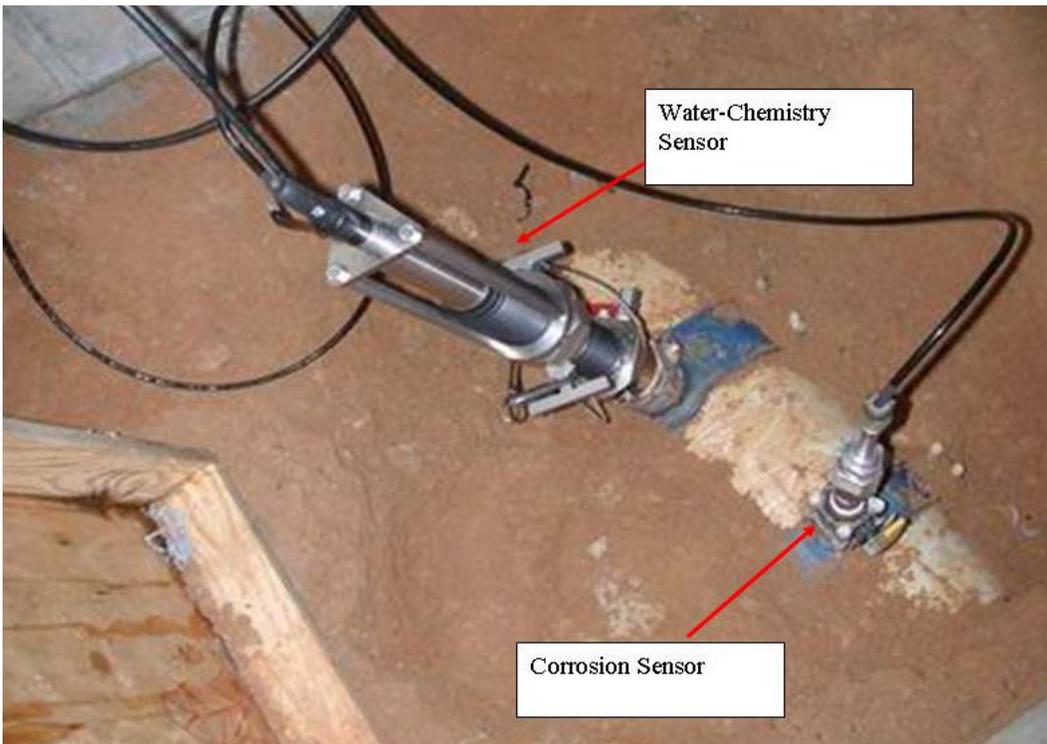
Sensors in Simmons vault before pouring of concrete floor.
